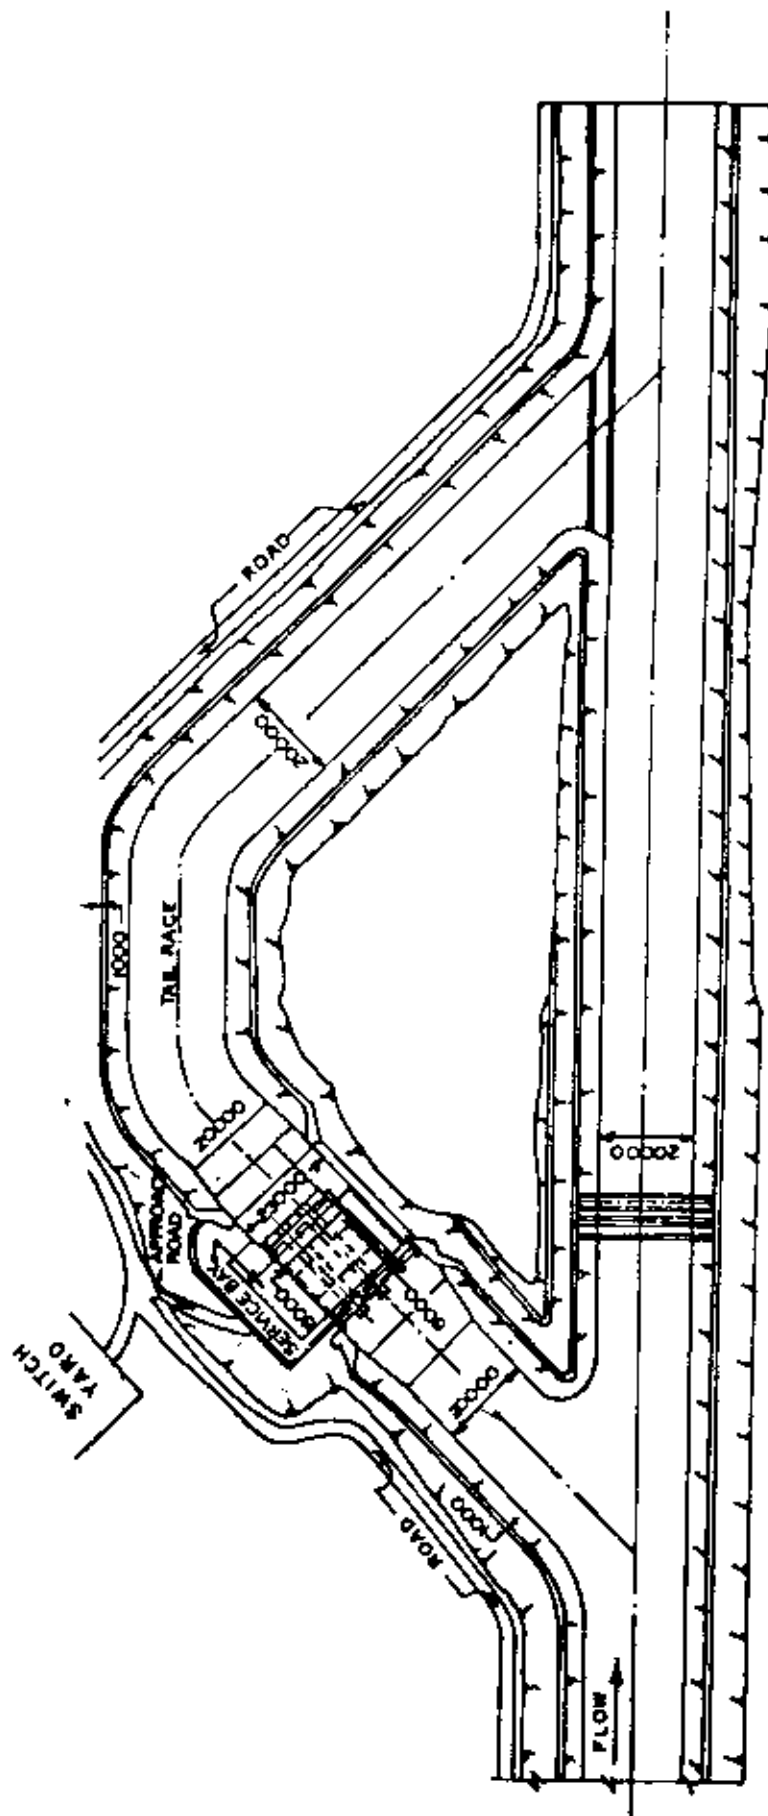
GENERAL LAYOUT PLAN OF CANAL POWER HOUSE
